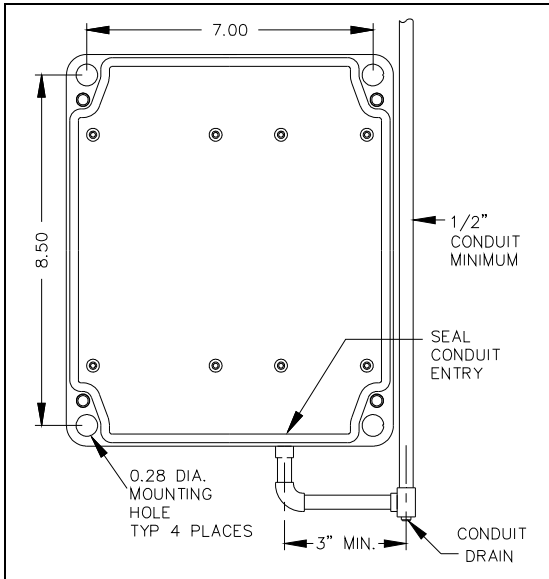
Bottom entry conduit recommended for non-metallic enclosures
